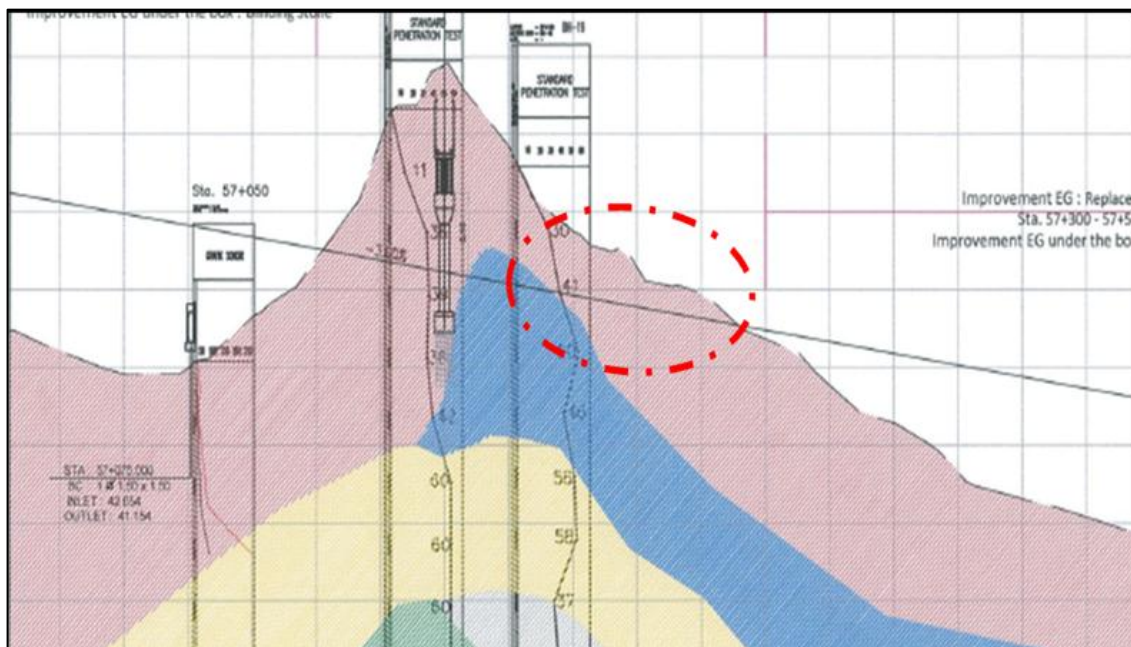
Elevation of the Serang – Panimbang Section III Toll Road construction plan
